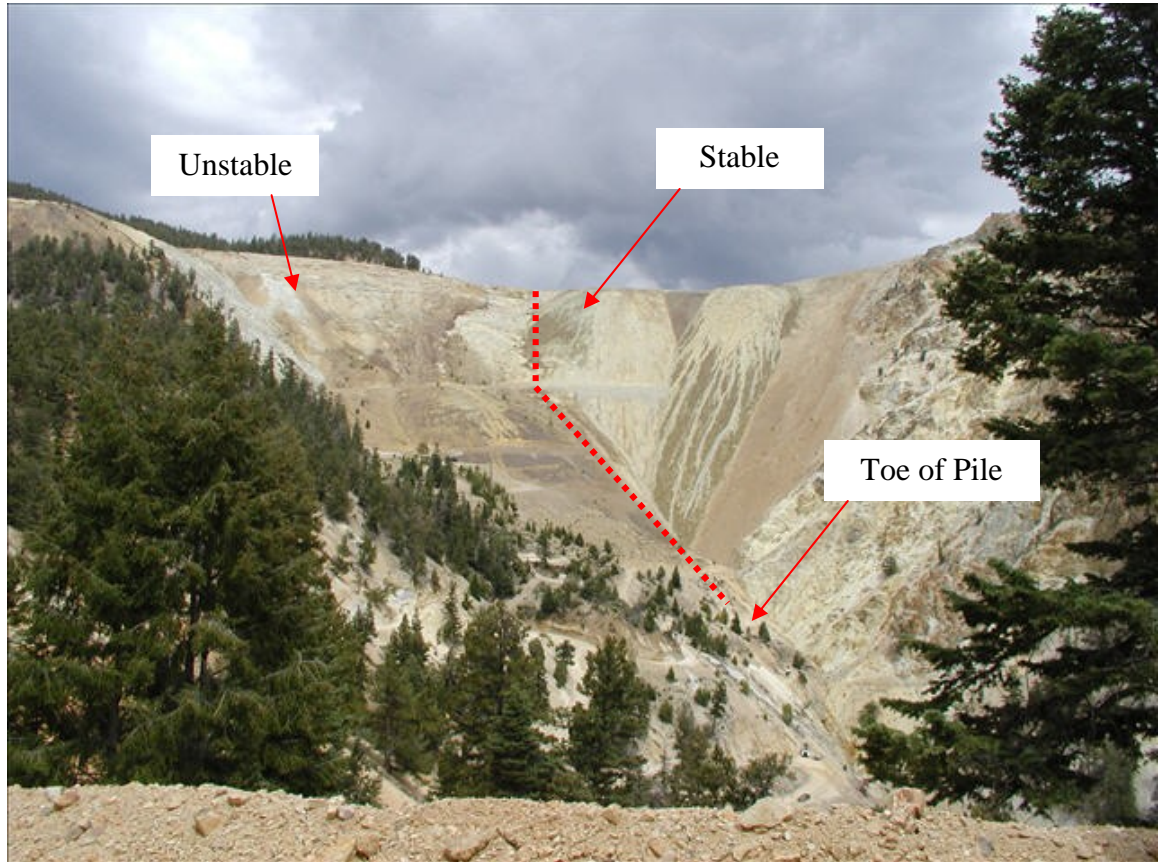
Goathill North Rock Pile viewed from the west before deconstruction
